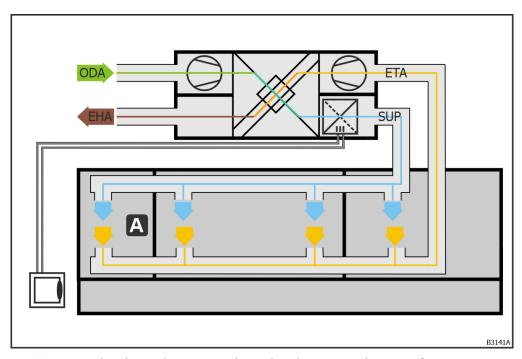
AHU with split outdoor unit and ventilated spaces without a refrigerant sensor A – smallest ventilated room
